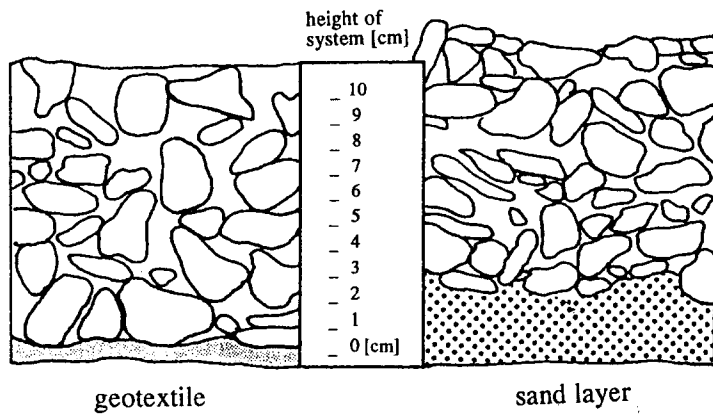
Cross-section of grouted testing systems with different types of protection layers
